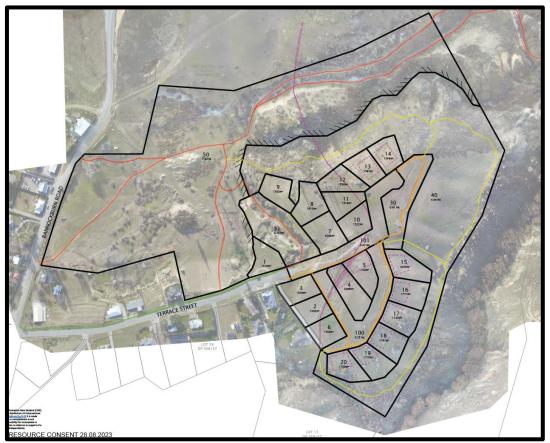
Subdivision Masterplan - Pink Line demarcates the BLR (Source Application
